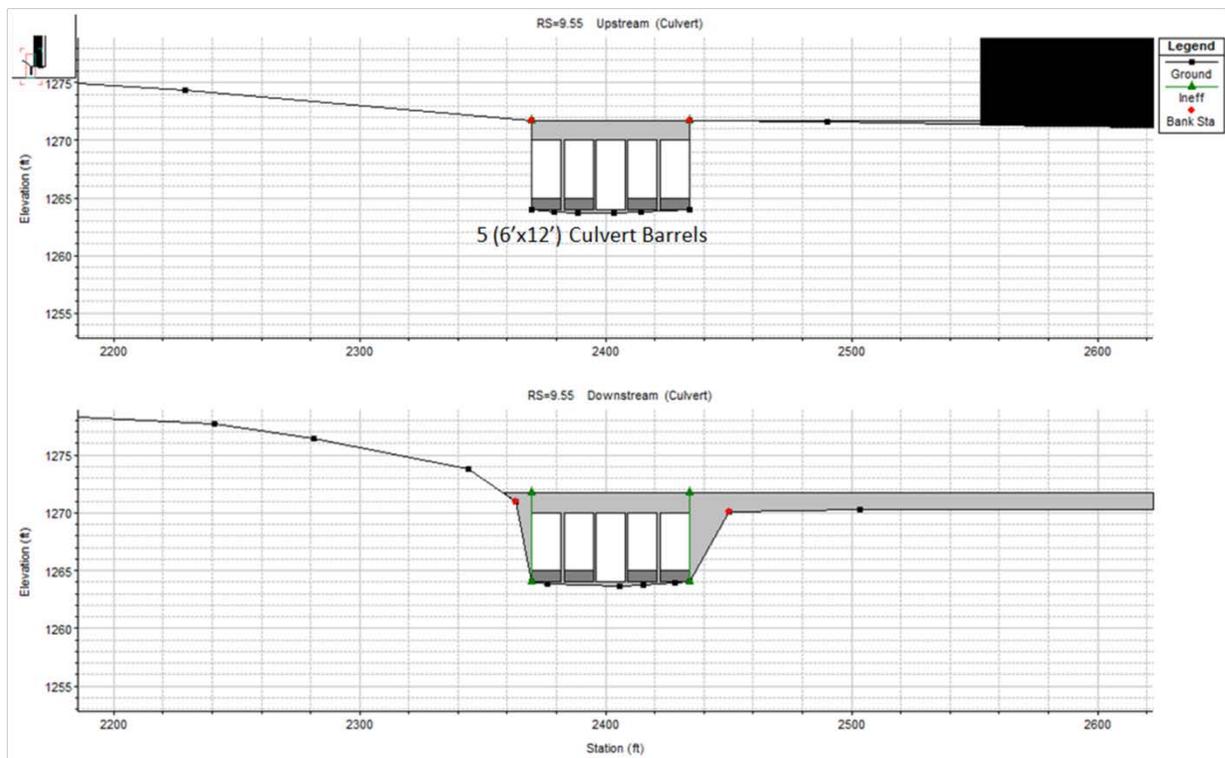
Cross-Sections of Design Option 1 for Culvert 5722
